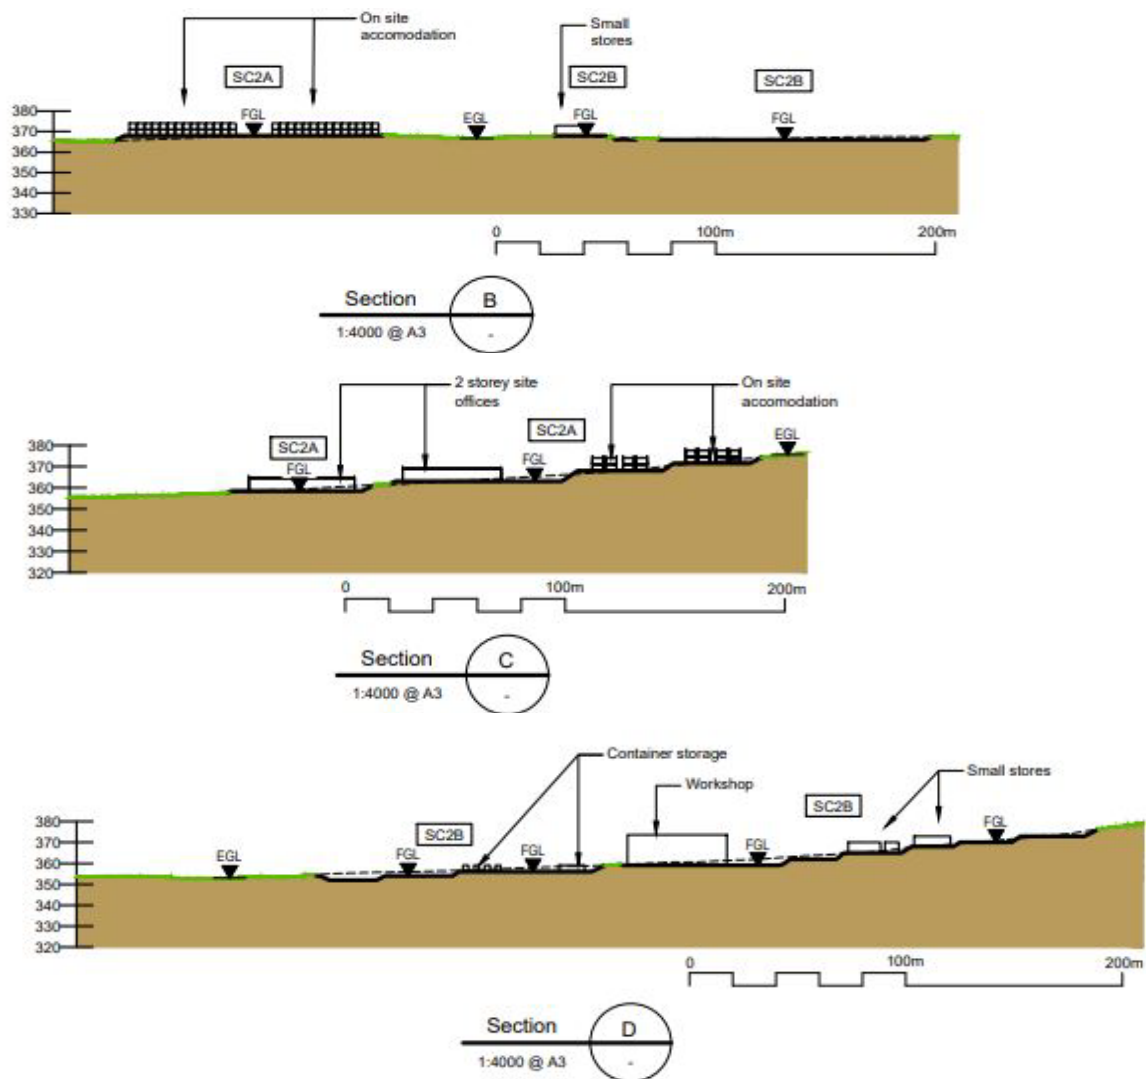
Sections through Main Site Compound 2 at Shuas Dam
